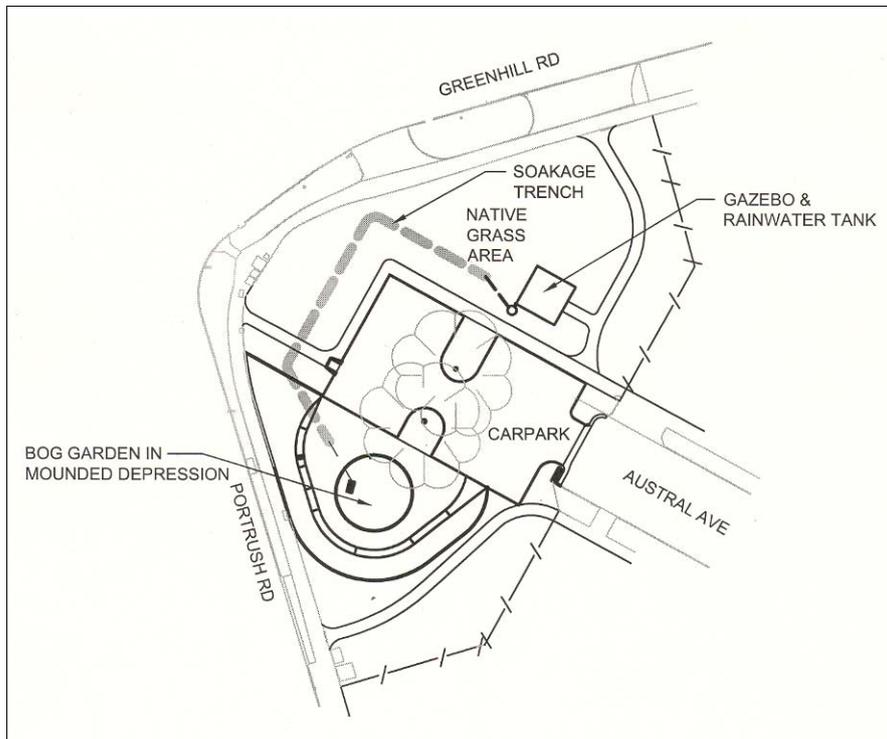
Location Plan of the Pervious Pavements, Linden Gardens
